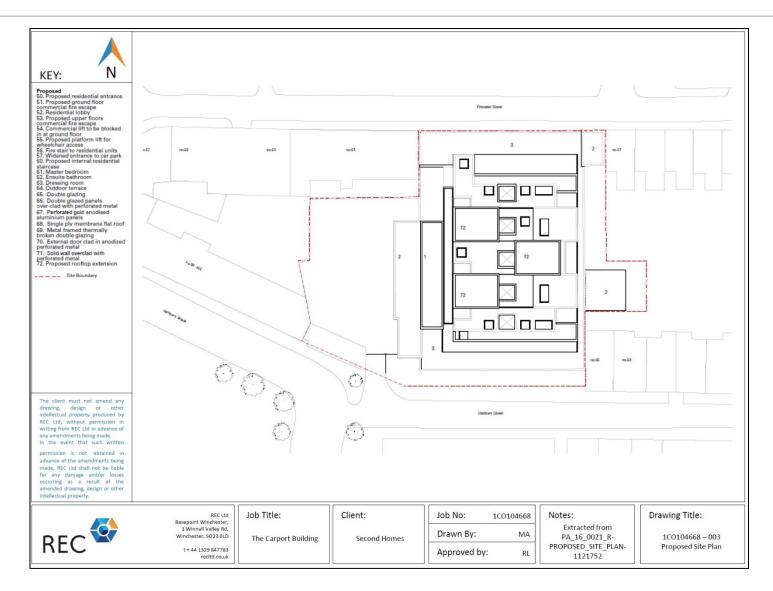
Proposed outline site plan (Reproduced by courtesy of REC)
